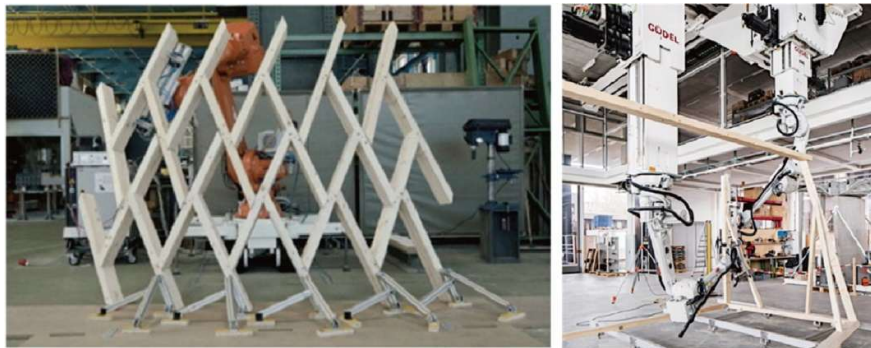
Robotically assembled prototypes using one or more robots © ETH Zurich [14].
